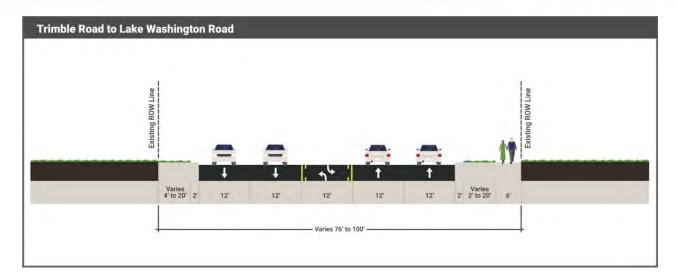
Existing Typical Section - Wickham Road from Trimble Road to Lake Washington Road
